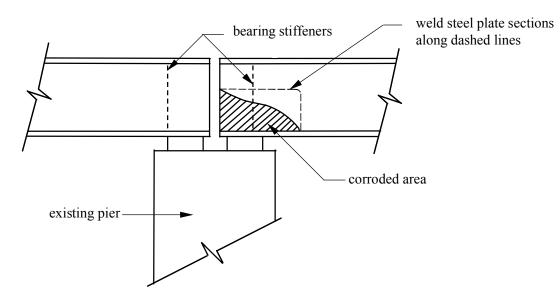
Repair of Corroded Steel Beam Ends.
